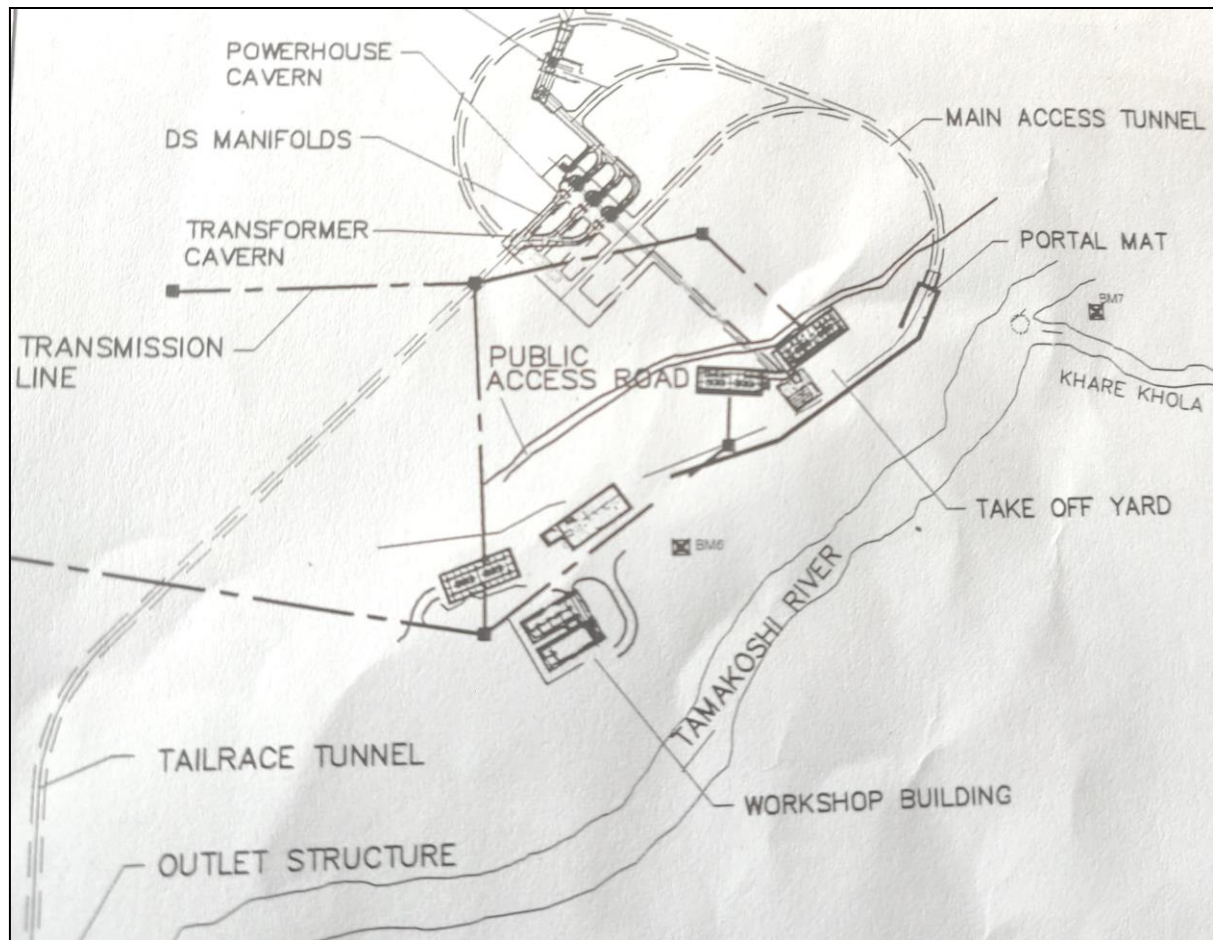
Sketch of the Plan of Workshop Building and Surrounding Structures
